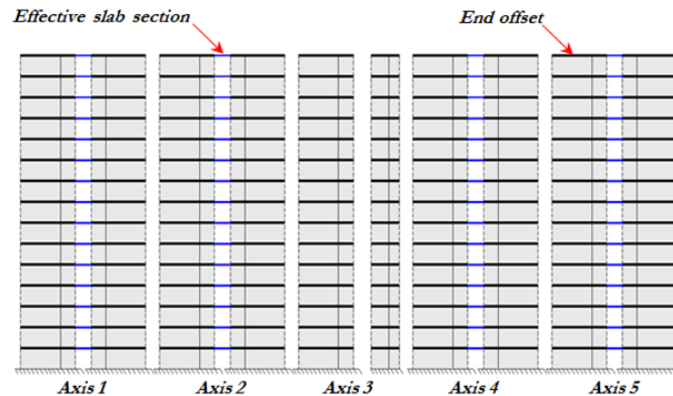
RUAUMOKO 2D structural model of studied buildings.
